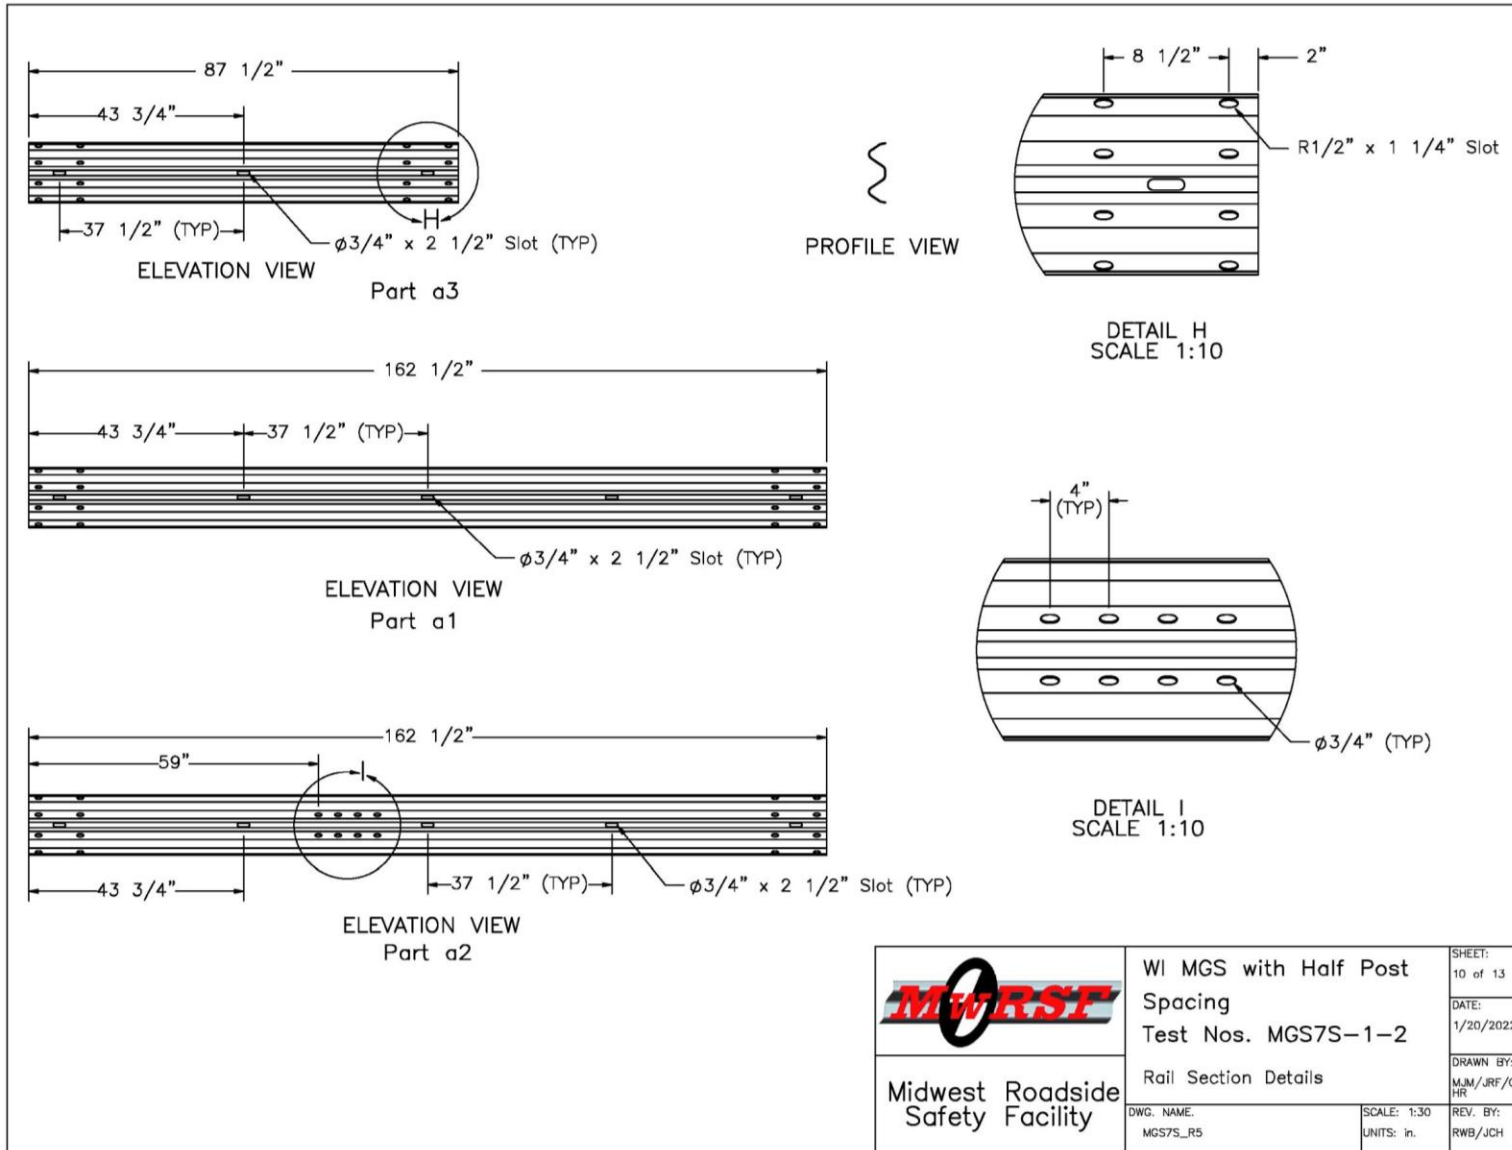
Rail Section Details, Test Nos. MGS7S-1 and MGS7S-2
